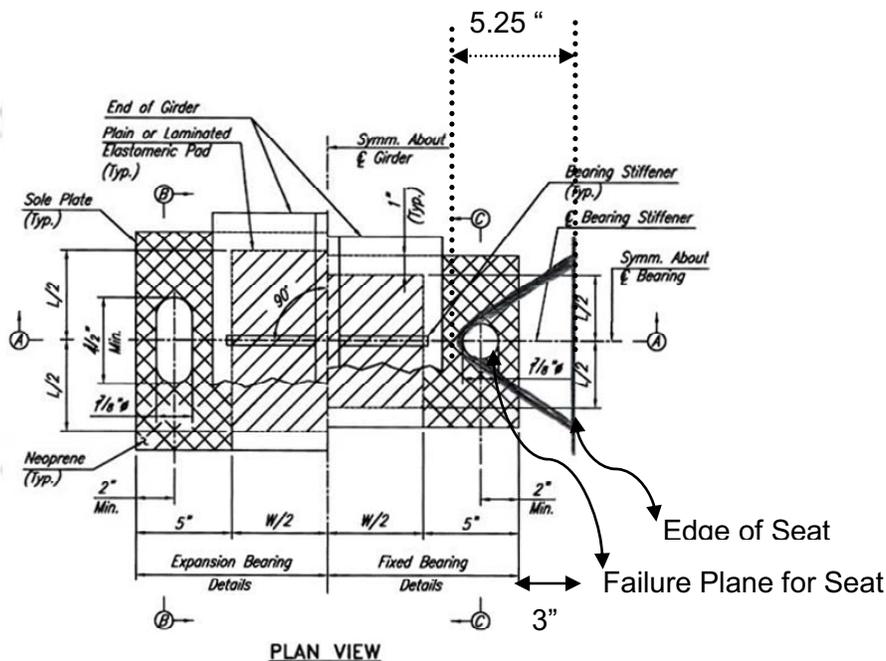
Anchor Bolt Shear Failure Plane (Connection Details Not Applicable See Figure 5.5)
